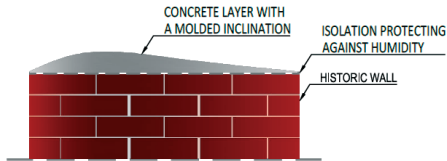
Crest molding with mortar or concrete./ Securing layer with a molded inclination/ Concrete layer with a molded inclination/ Isolation protecting against humidity/ Historic wall.
